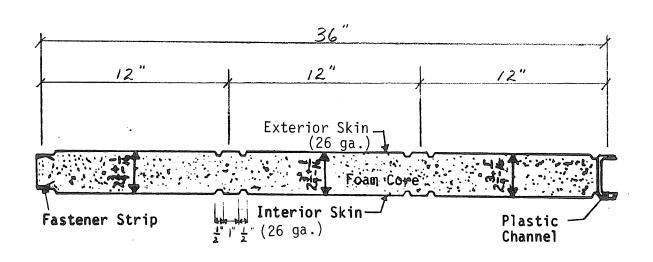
StarTherm/StarWall Wall Panel, Cross-Sectional View
